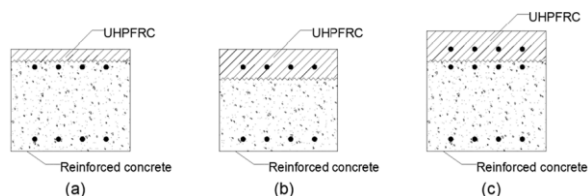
Concepts and principles of a composite structural member in which the ultra-high-performance fibre-reinforced concrete (UHPFRC) layer serves as: (a) a protective layer without reinforcement; (b) a protective layer with embedded reinforcement; and (c) a strengthening layer providing both structural protection and enhanced load-bearing capacity [31].
